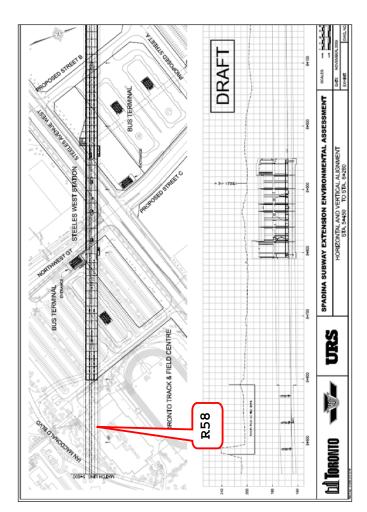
PLAN AND PROFILE OF THE PROPOSED SUBWAY ALIGNMENT
